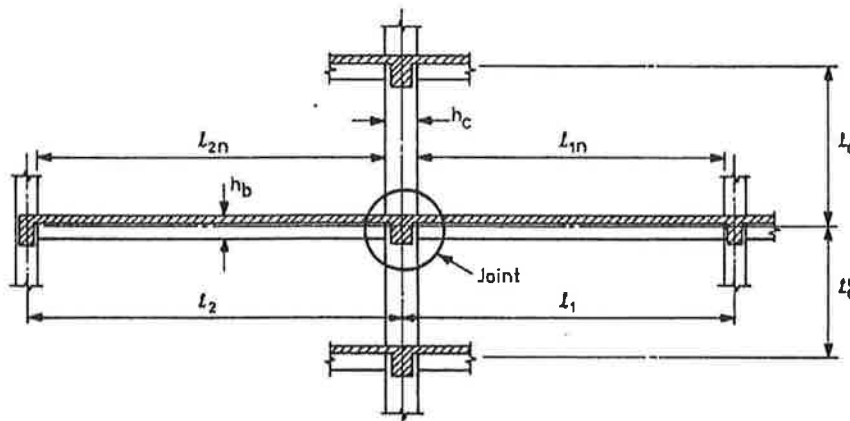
AN INTERIOR BEAM-COLUMN JOINT
